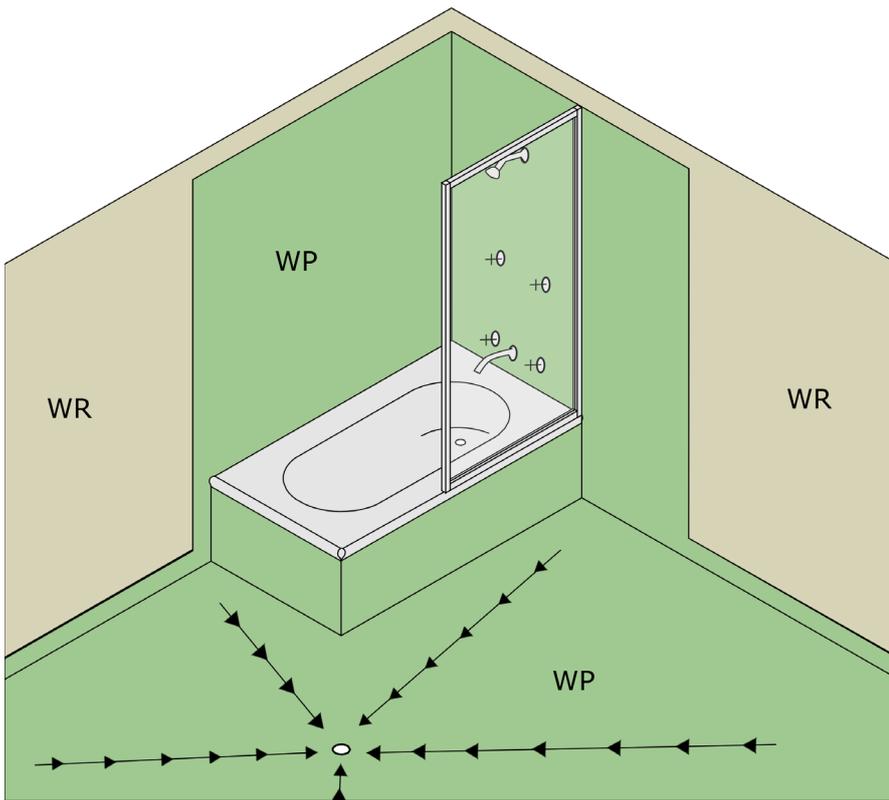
HYDRO BAN® to unenclosed wet area shower
